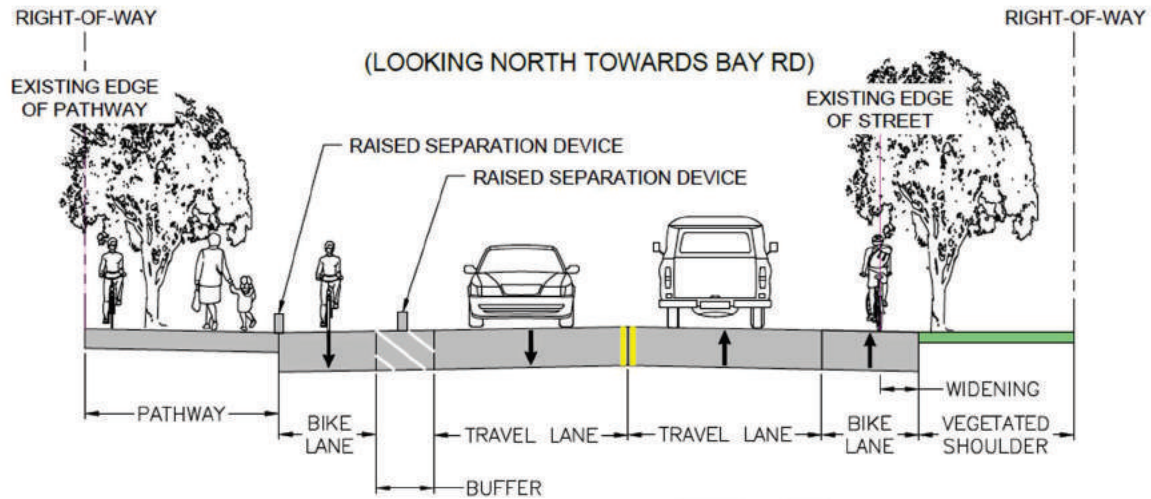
Ringwood Avenue (Laurel School Lower Campus) Preferred Alternative Bike Lanes (Protected near Schools) with Off-street Pathway
